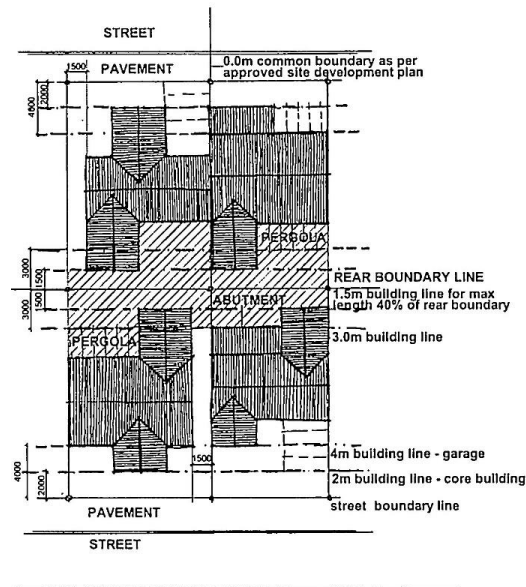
Illustration of stepped building line along rear boundary that encourages a varied building footprint
